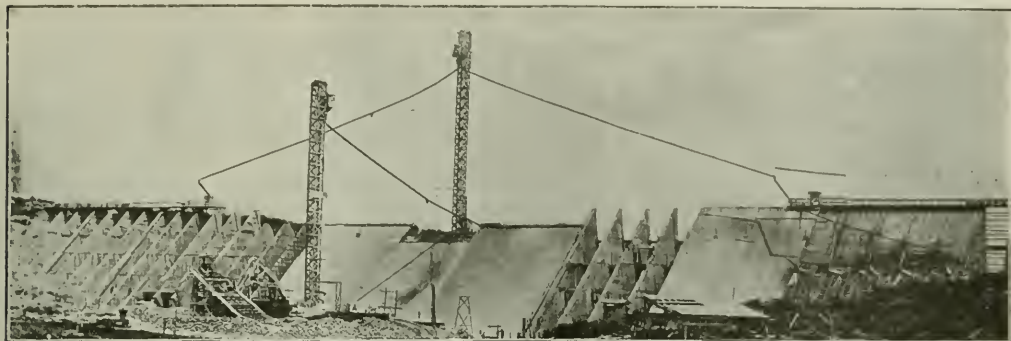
DAM UNDER CONSTRUCTION SHOWING CONCRETE DISTRIBUTING TOWERS
